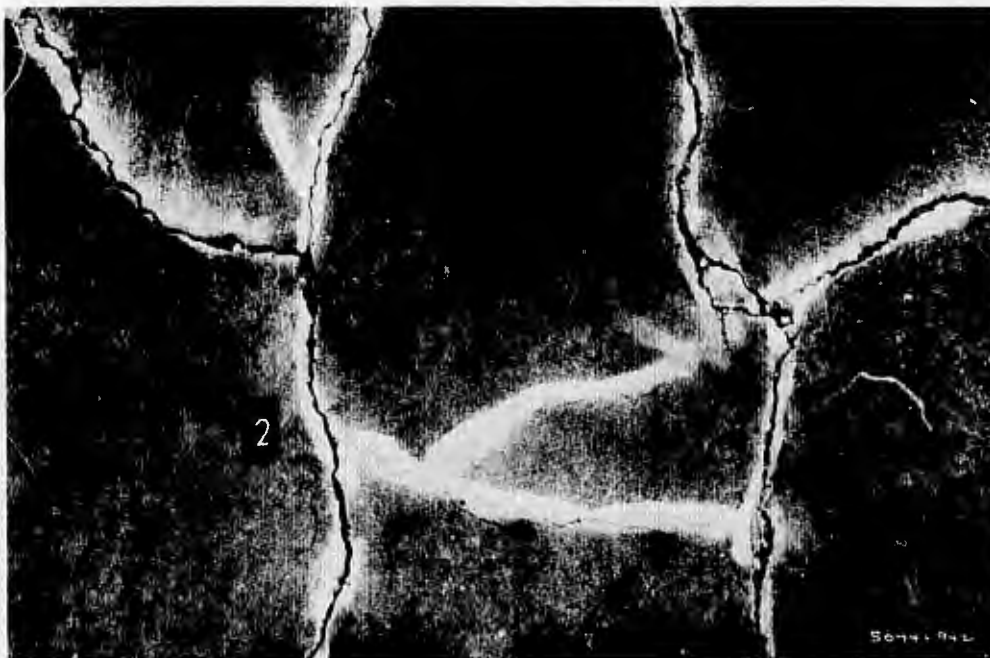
Cracks in a fibrous concrete test pavement at complete failure
